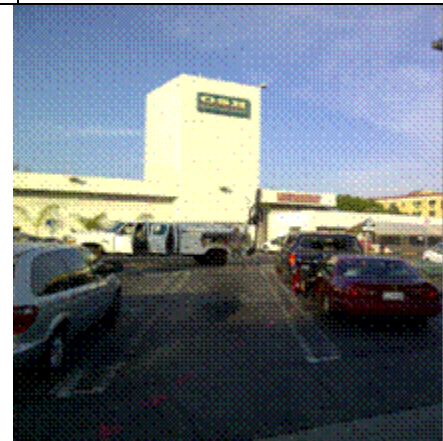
View northeast toward Orchard Supply entrance, drilling operation for soil boring B9
